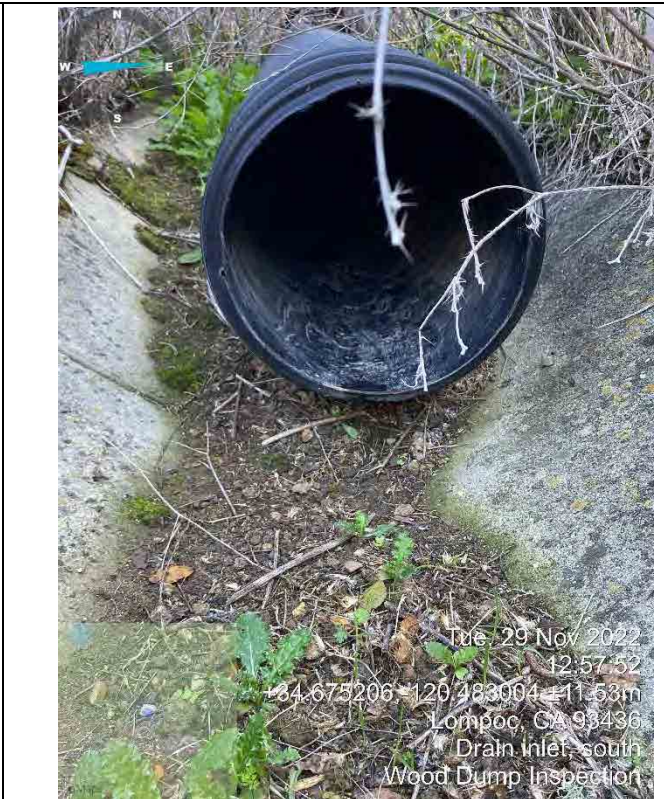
Southern 12" HDPE Pipe Outlet Within V-Ditch– pipe in good condition and unobstructed (facing east)
